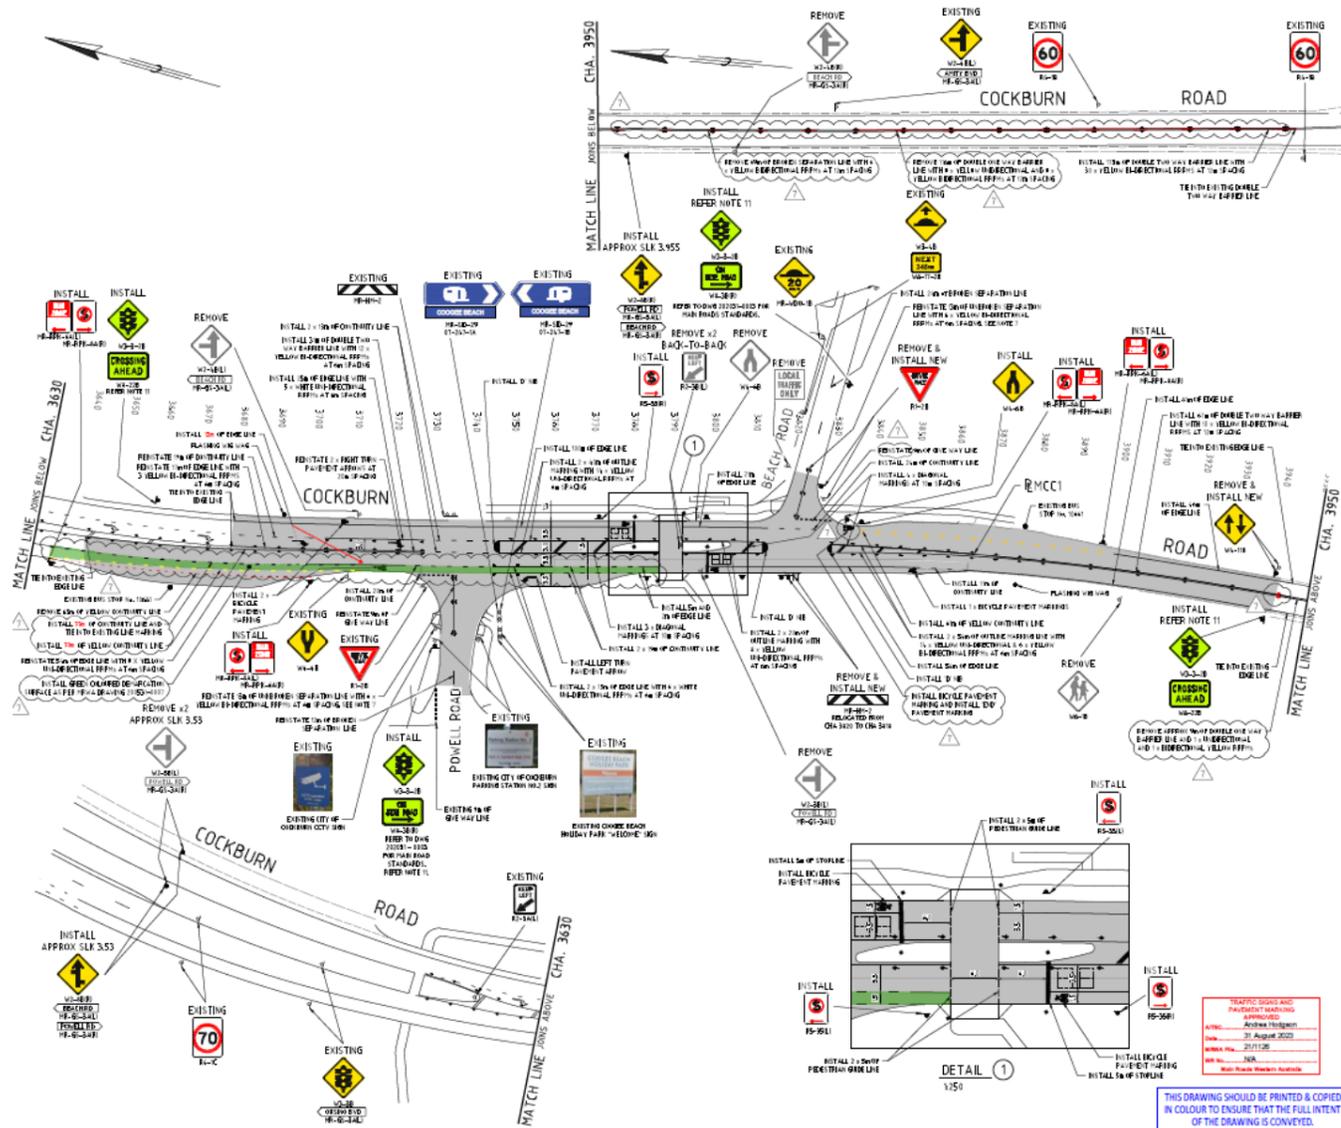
Pedestrian signals layout plan (source: Main Roads WA)
